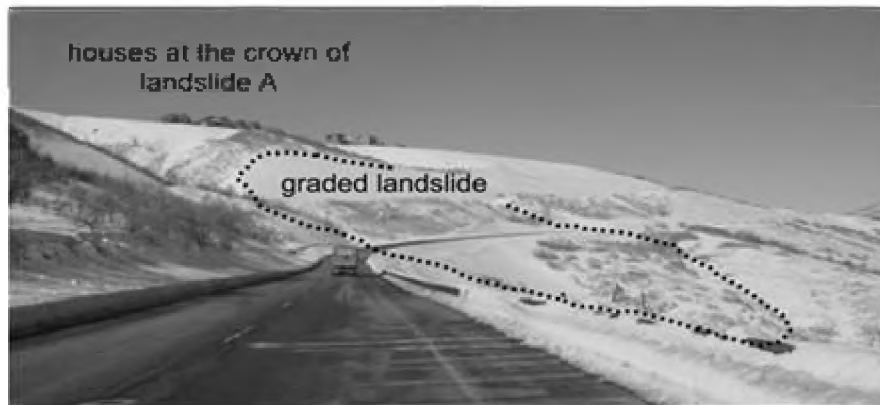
Looking due north along the Traverse Ridge Road, where road construction and grading efforts have deforested the natural environment and altered much of the topography created by deposits of landslide A. Houses have been built at the crown of Landslide A, in a domain that lies within another, larger landslide deposit. Garbage truck for scale.
